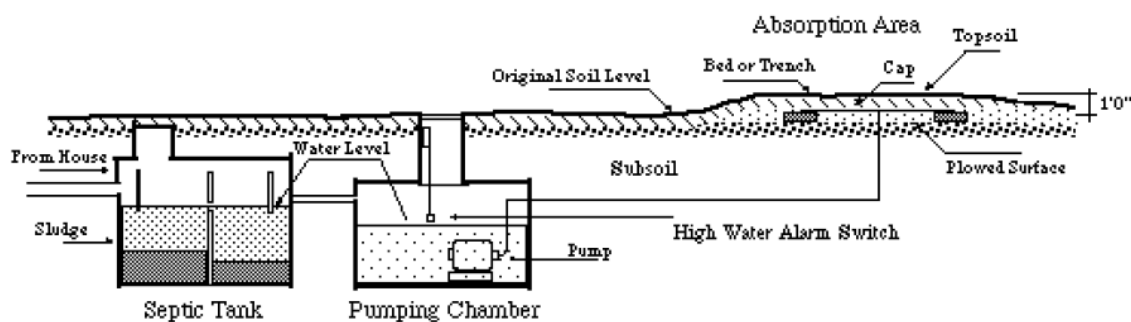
Illustration shallow trench section view (Yeang & Woo, 213.)
